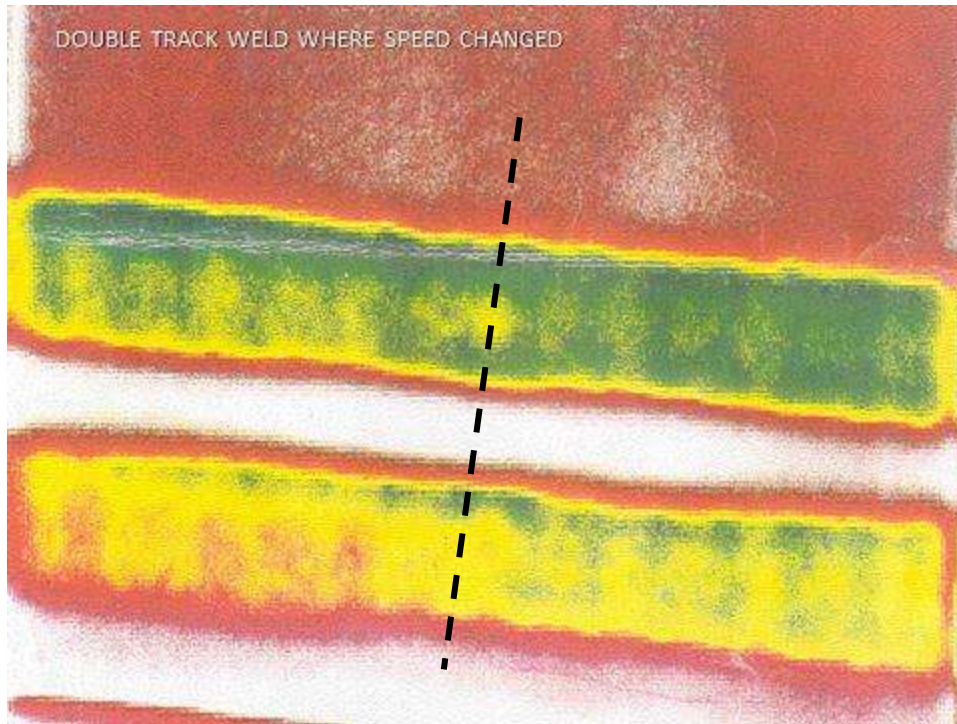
Plan view of double track weld at location (dotted line) where welder speed was changed.
